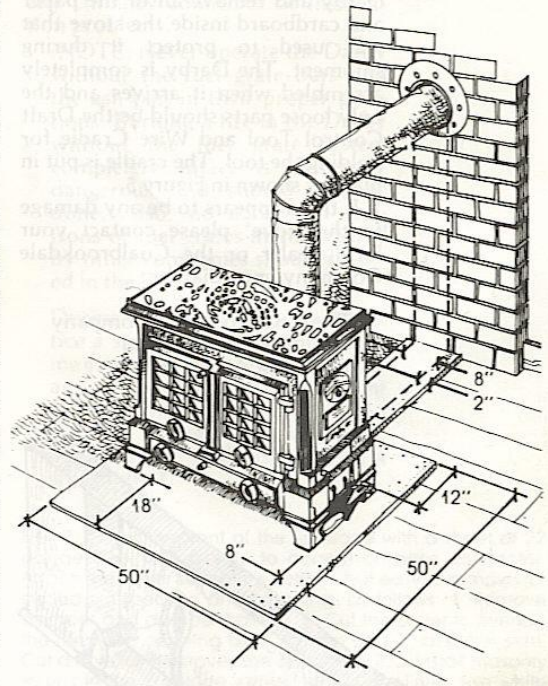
Dimensions of the floor protector underneath the Darby and its chimney connector.
